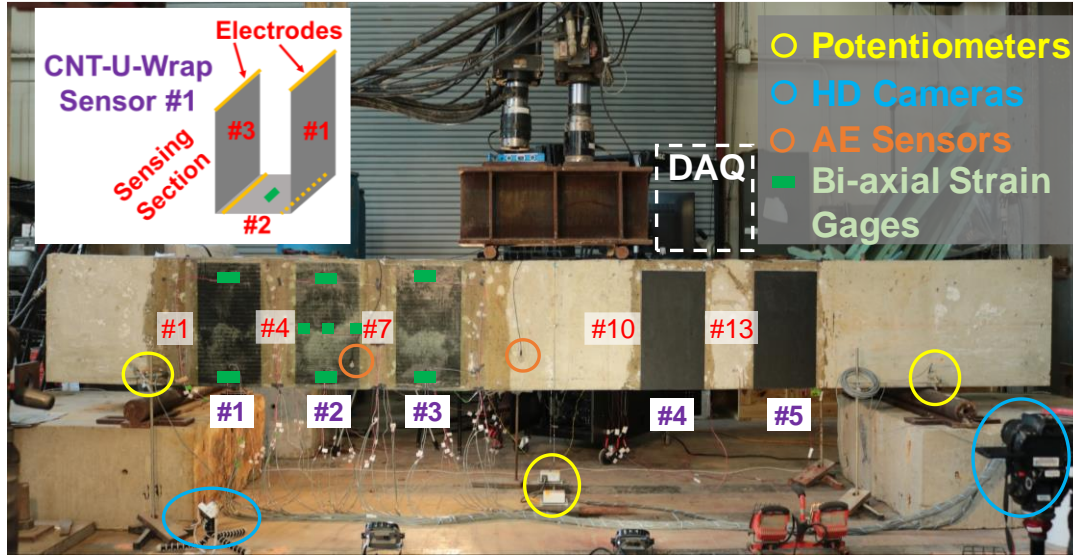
Instrumentation of the shear beam specimen. Note: (1) U-wrap #4 and #5 are nonstructural CNT-based sensors for SHM only; (2) sensing sections #2, 5, 8, 11, and #14 are on the soffit; (3) sensing sections #3, 6, and #9 are on the backside and 2 in. shorter than the front ones; (4) strain gages on the back face are symmetric to the arrangement of gages on the front face.
